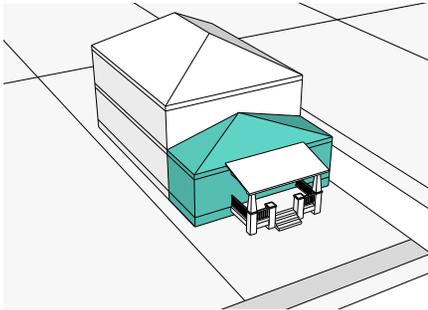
Use façade articulation techniques to help a building fit within the scale of the surrounding historic context.
